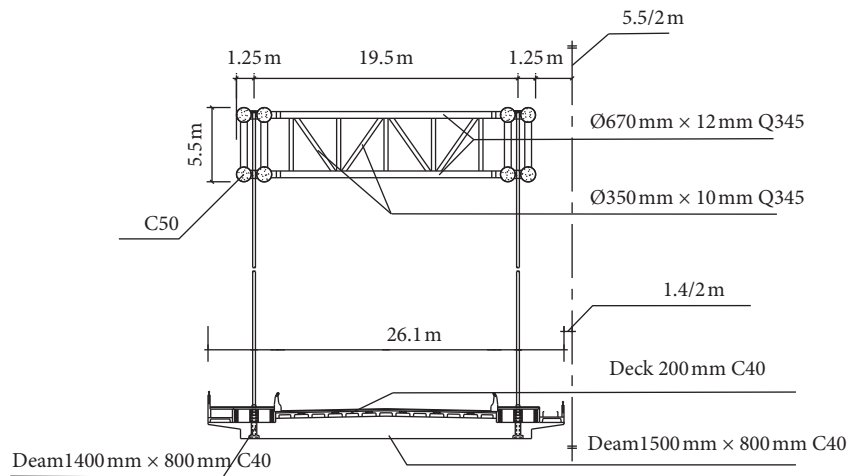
Transverse cross-section of the CFST arch bridge.
